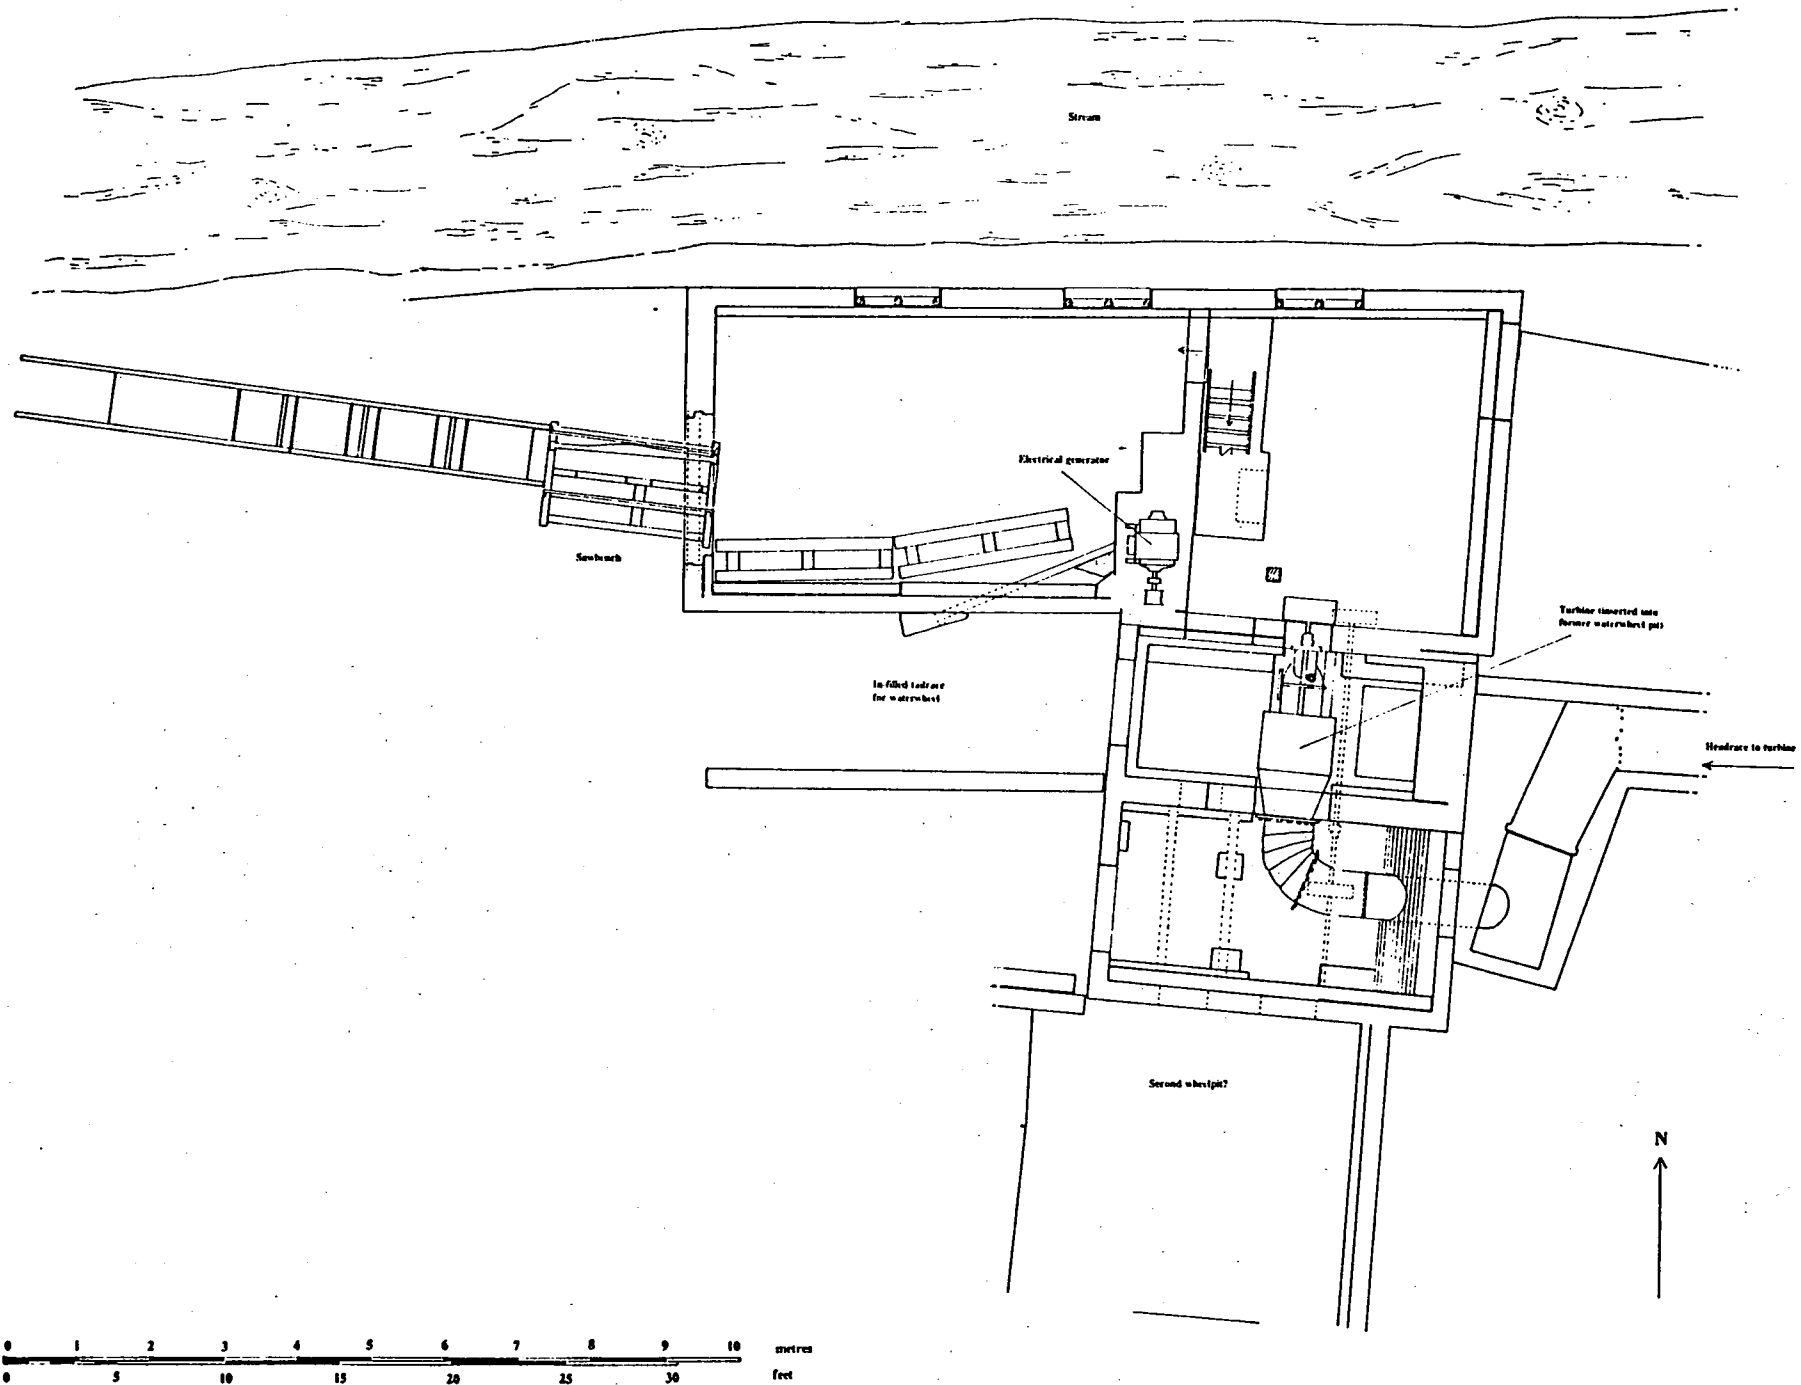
Ground floor plan of the sawmill and turbine house on the Home Farm, Stowe.
